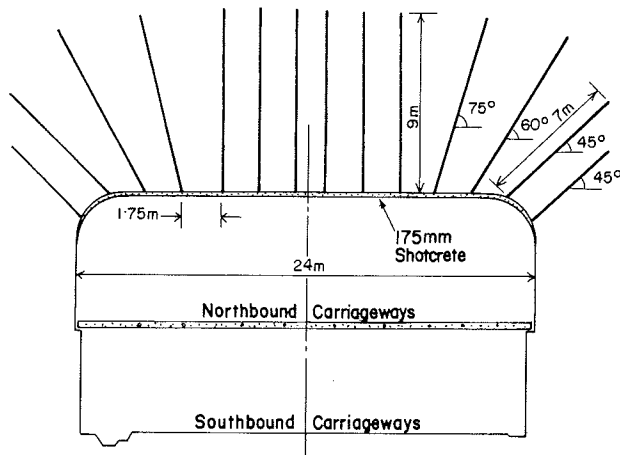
Twenty-four metre span section of double decker Eastern Distributor.
